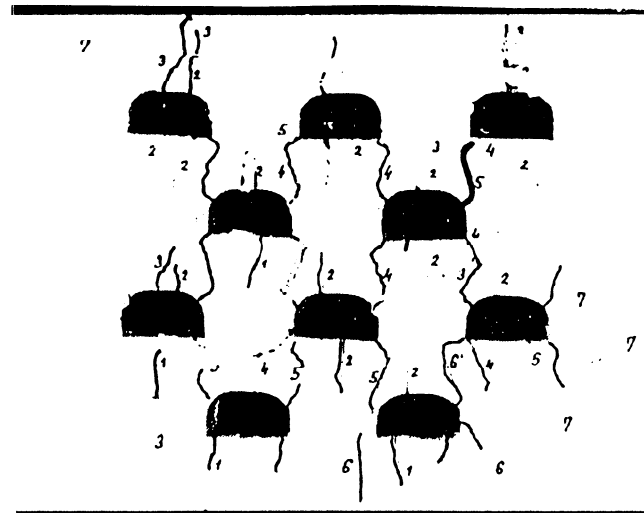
Plaster model showing characteristic failure of a "checkered" sublevel drift structure. Failure is caused by shear cracks between the closest corners of overlying sublevel drifts.
